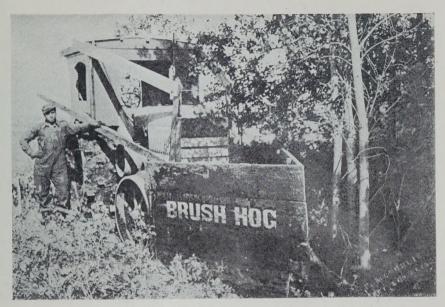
The early predecessor of the modern crawler tractor brush cutter.
